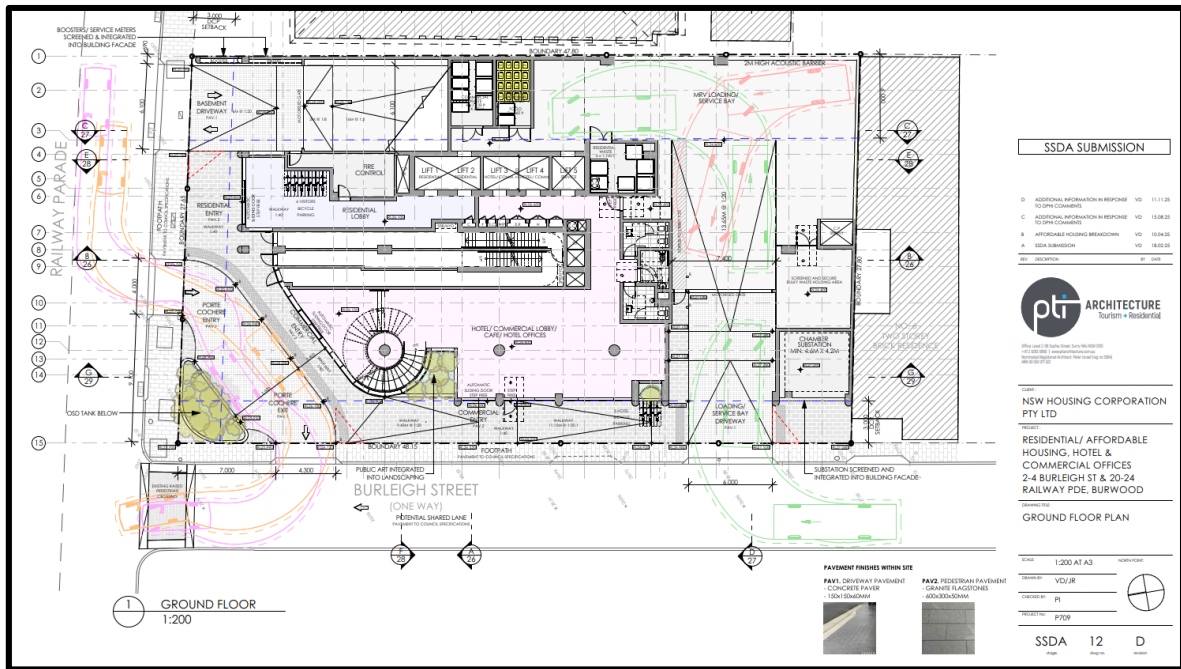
Proposed Porte-Cochere (Source Architectural Plan Prepared by PTI Architects)
